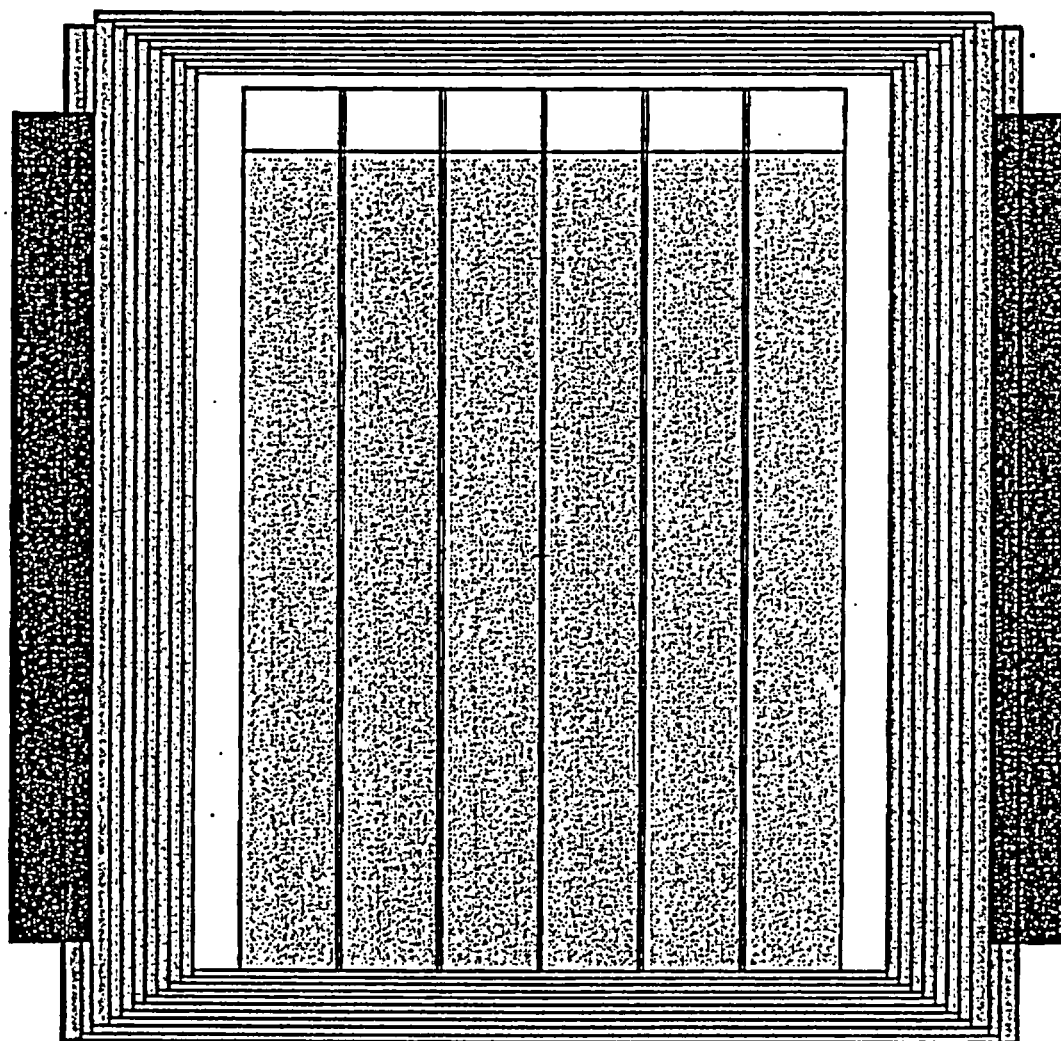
MC-10 Storage Cask Vertical Cross Section
